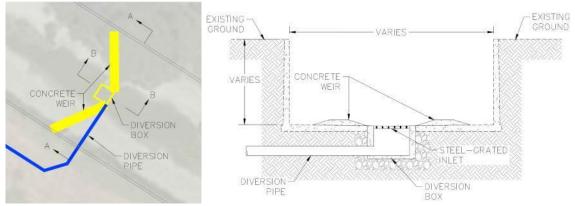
Diversion Alternative 2 - Concrete Weirs
